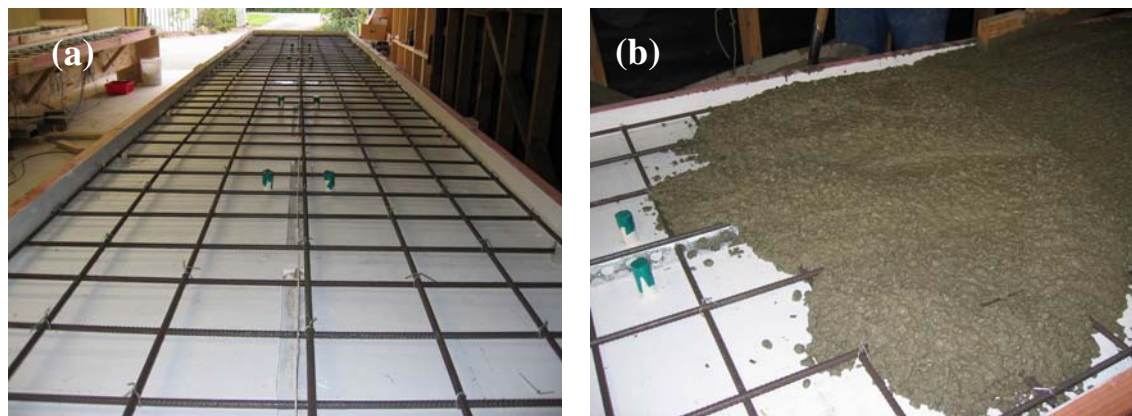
(a) Reinforcement laid and ready for concrete; (b) concreting process
